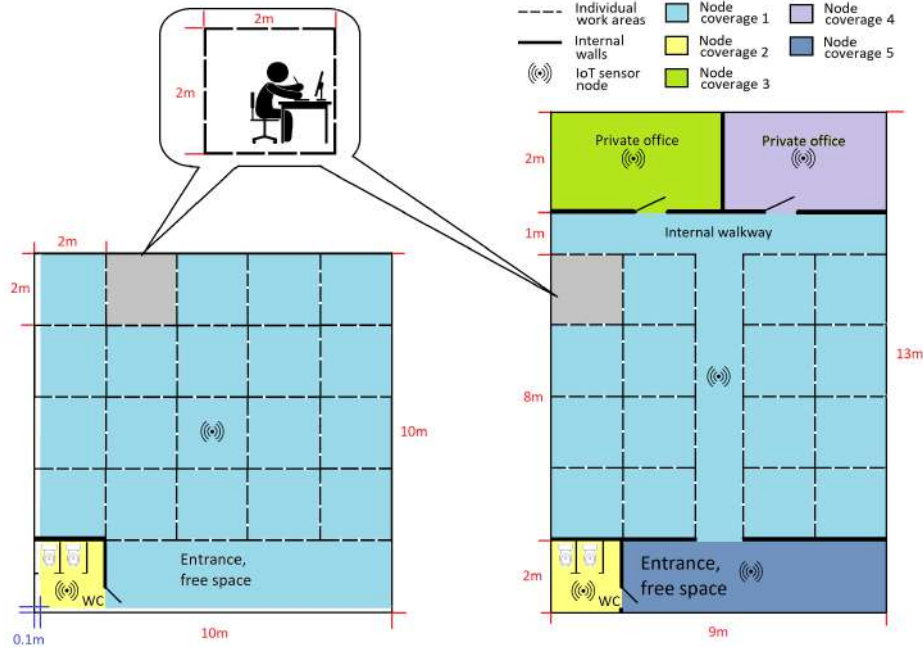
A: 10m x 10m open plan building, B: 9m x 13m building with multiple areas
